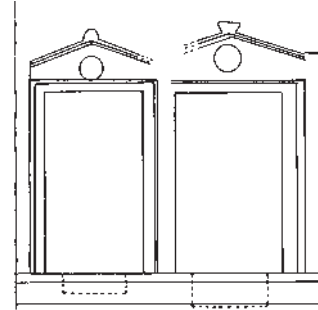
The niches (No. 3), elevation and plan. 1:50.
